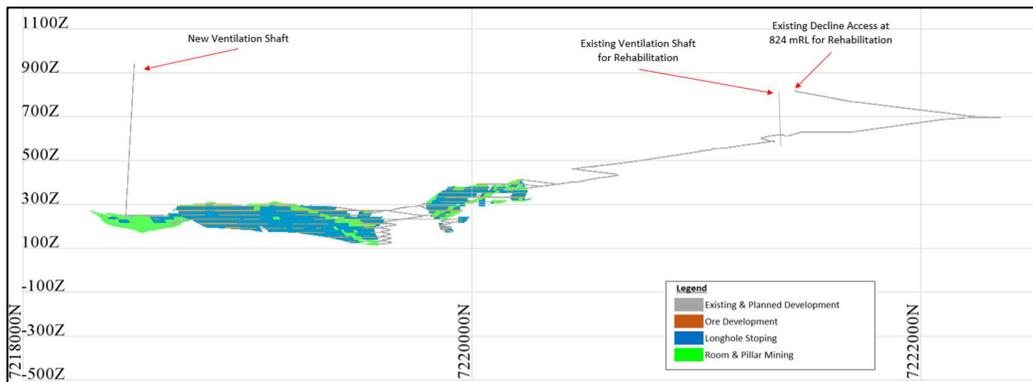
Long view of the Stekenjokk Mining Inventory by mining method and existing and planned development, looking northwest
